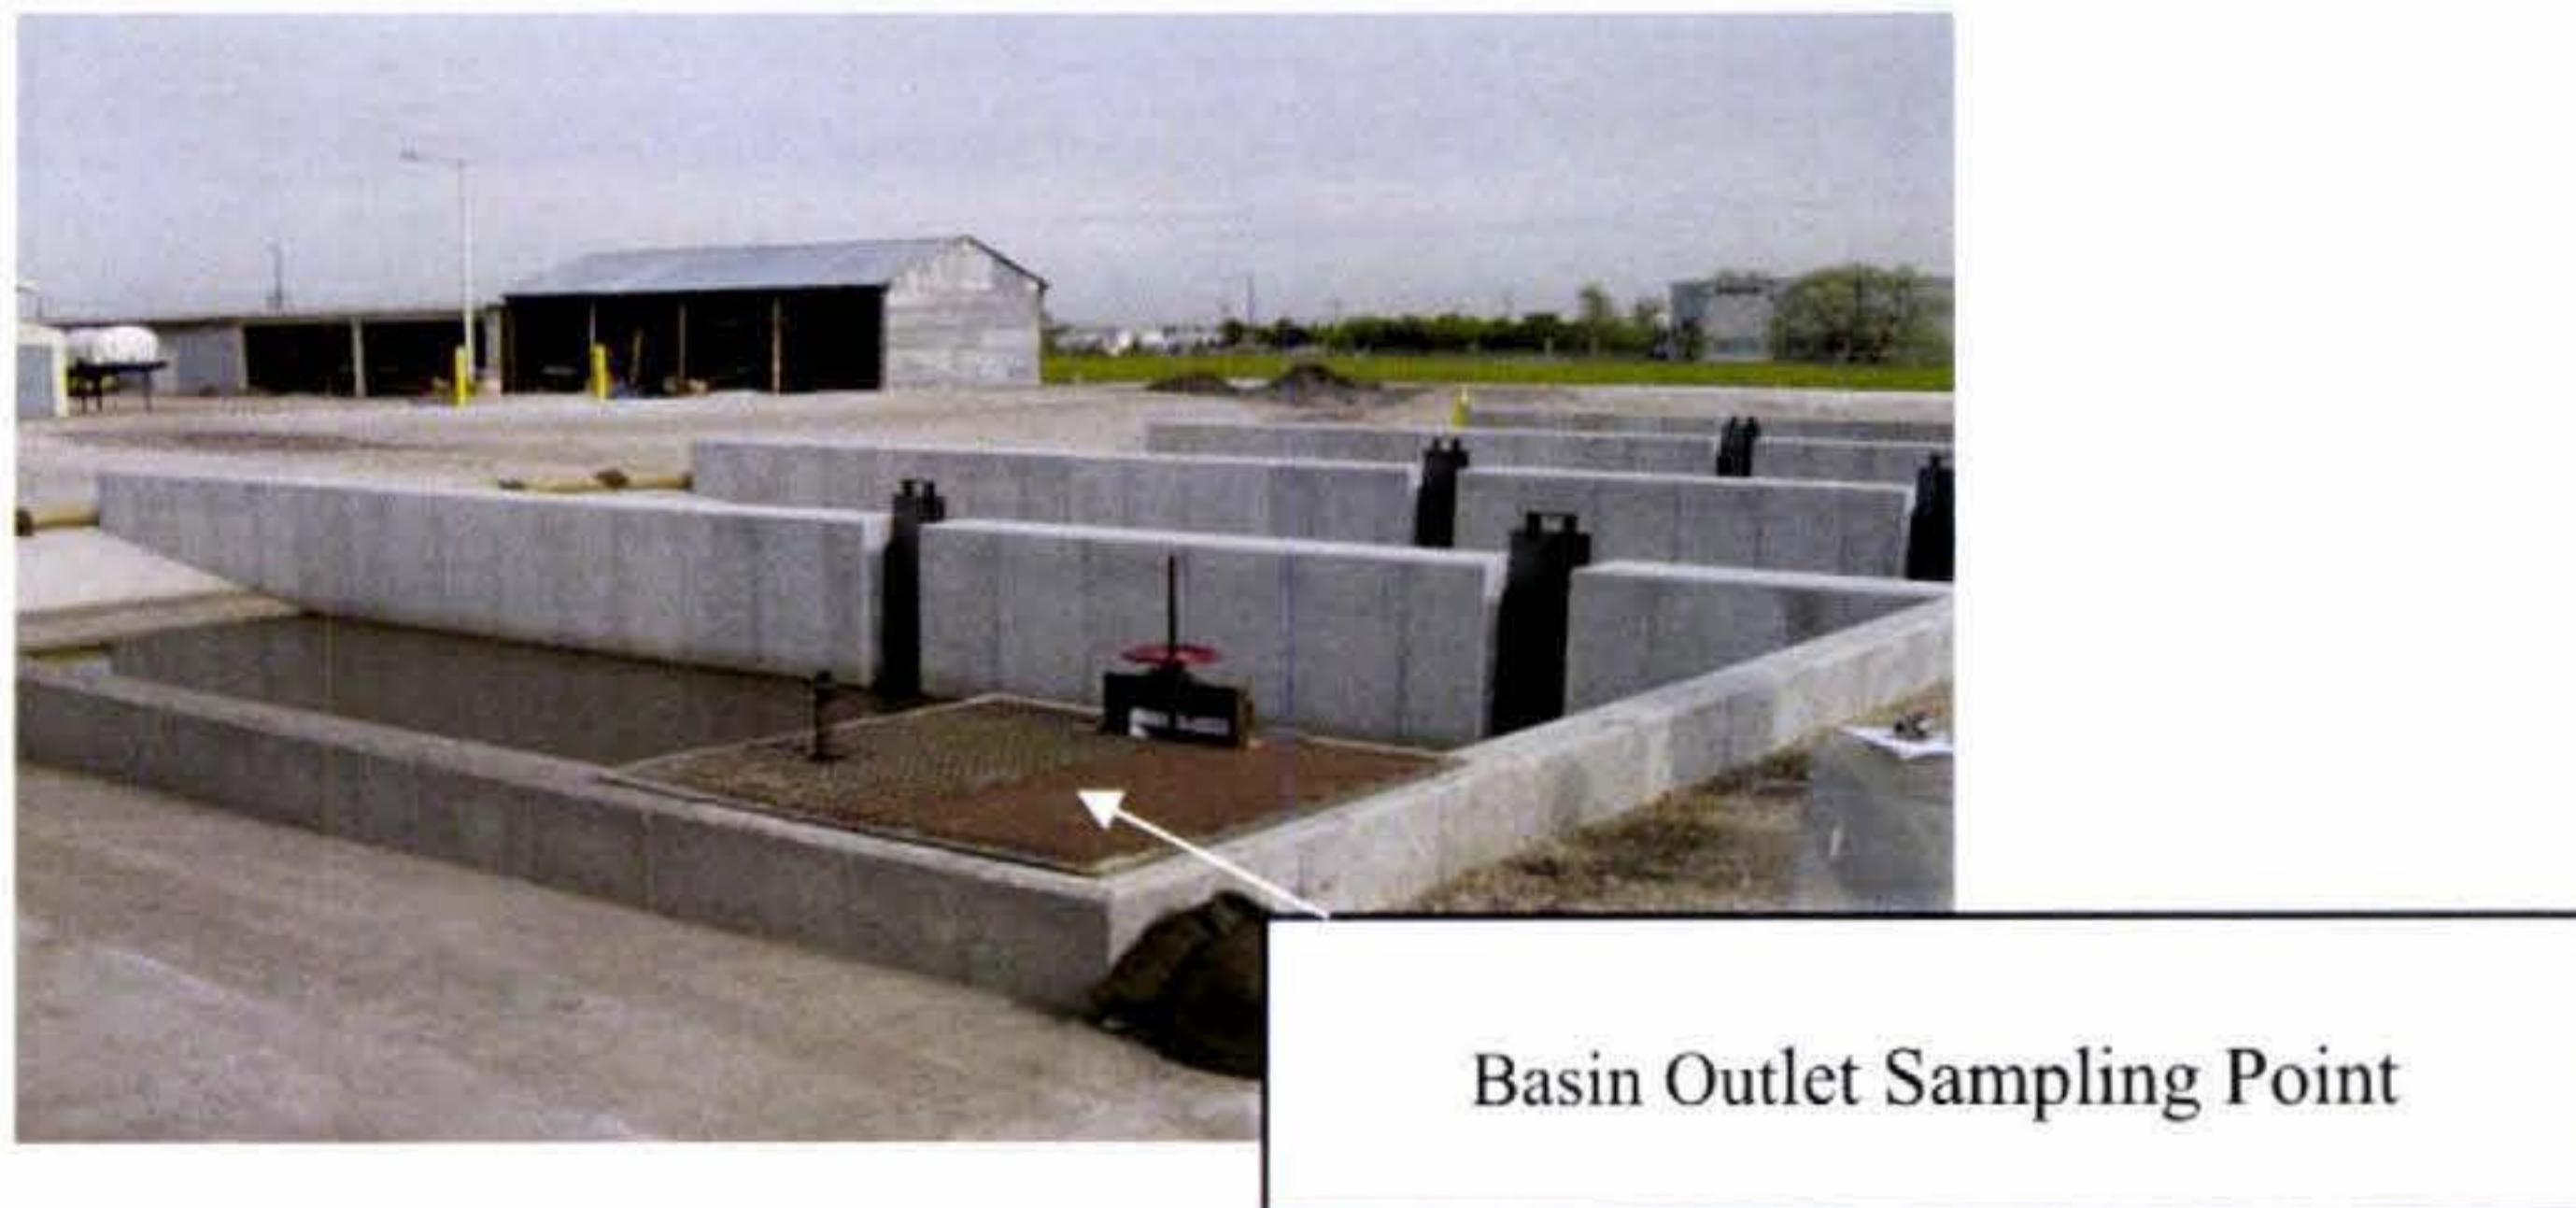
Basin Outlet Sampling Site, photo taken facing NW (photo by Monica Lowe/ACHD 2003)
